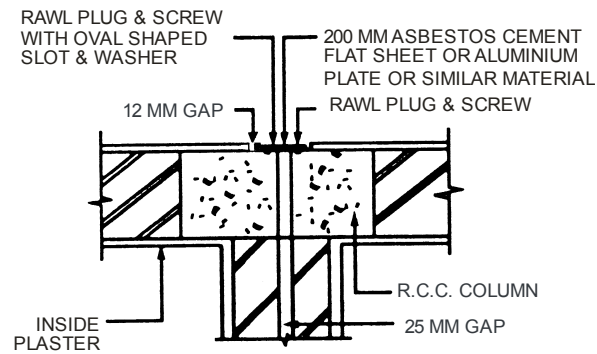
Typical Details of Expansion Joint Covering on Outer Face of Columns (Plan)
